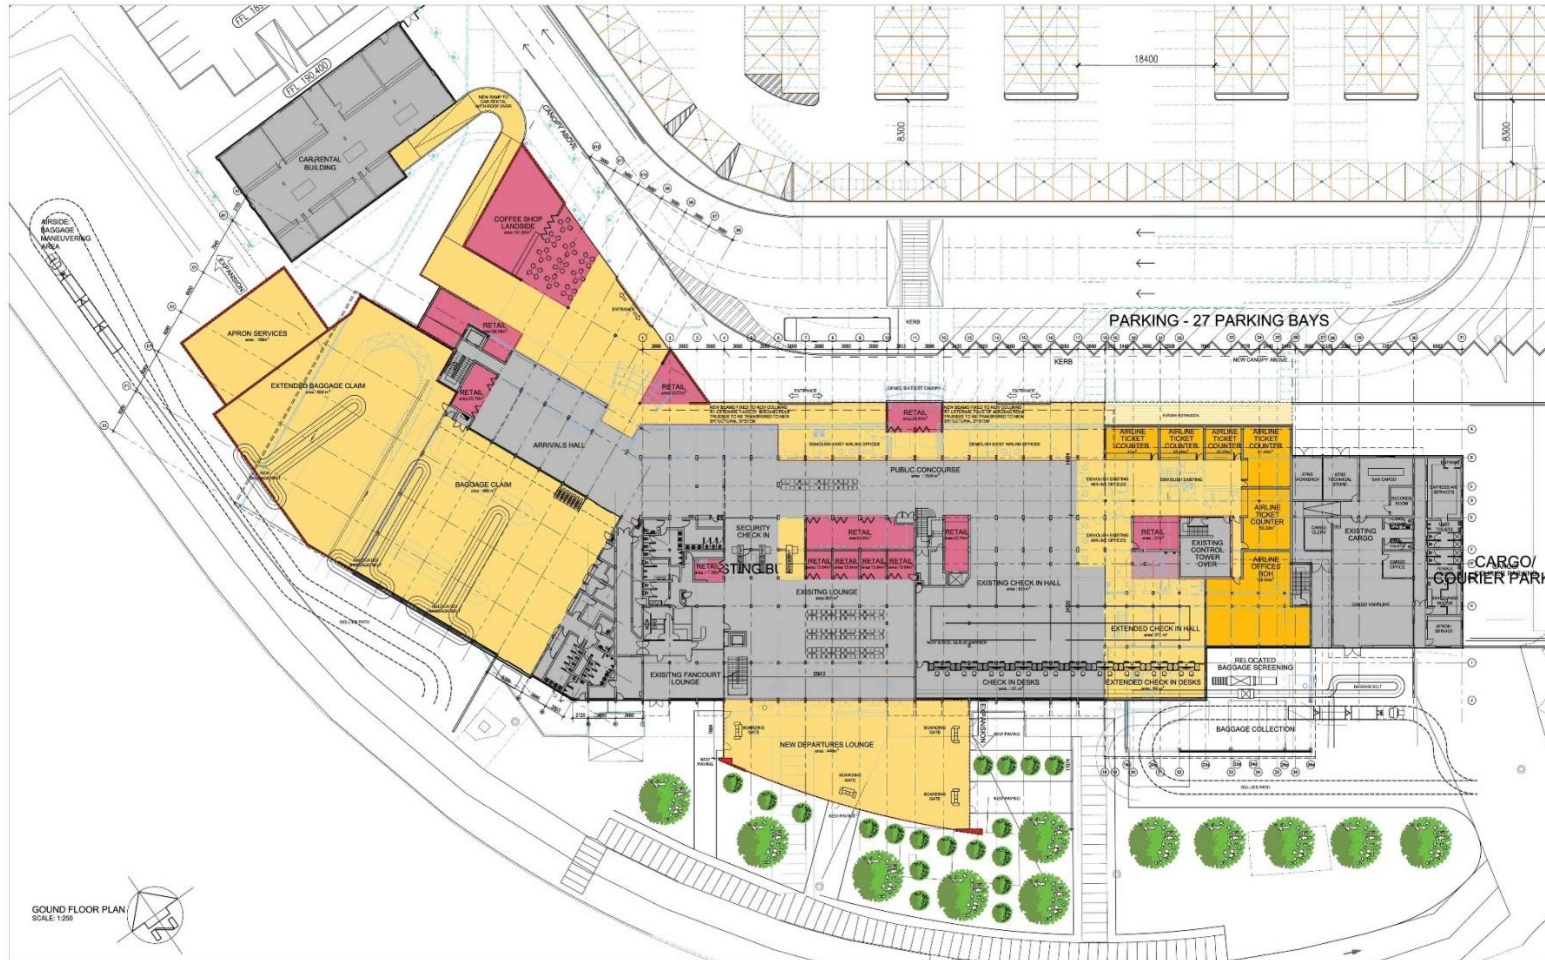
George Airport Terminal ACSA Concept Layout: GROUND FLOOR (Not to Scale)
